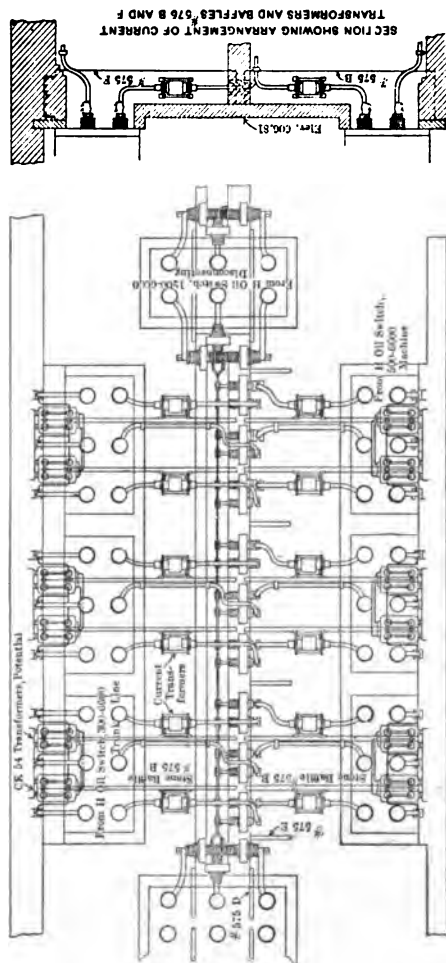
Delray, Detroit : Plan of Oil Switches, Disconnecting Switches, Transformers, and Cables.
